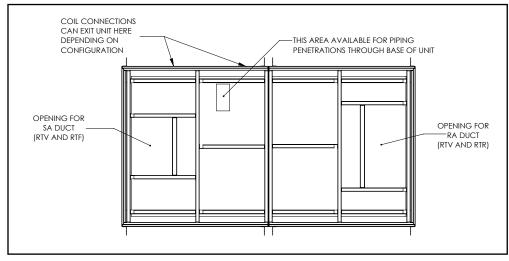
PIPING PENETRATIONS DRAWING B
